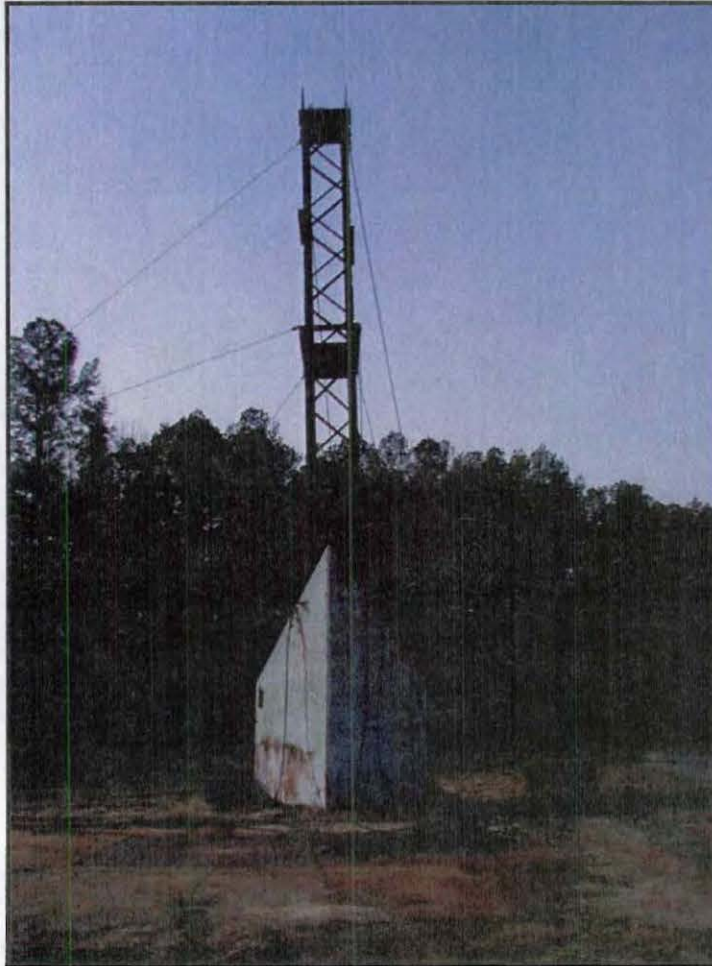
View of Structure 9450, 100-Foot Tower Drop, located in the Explosives Experimental Area.
